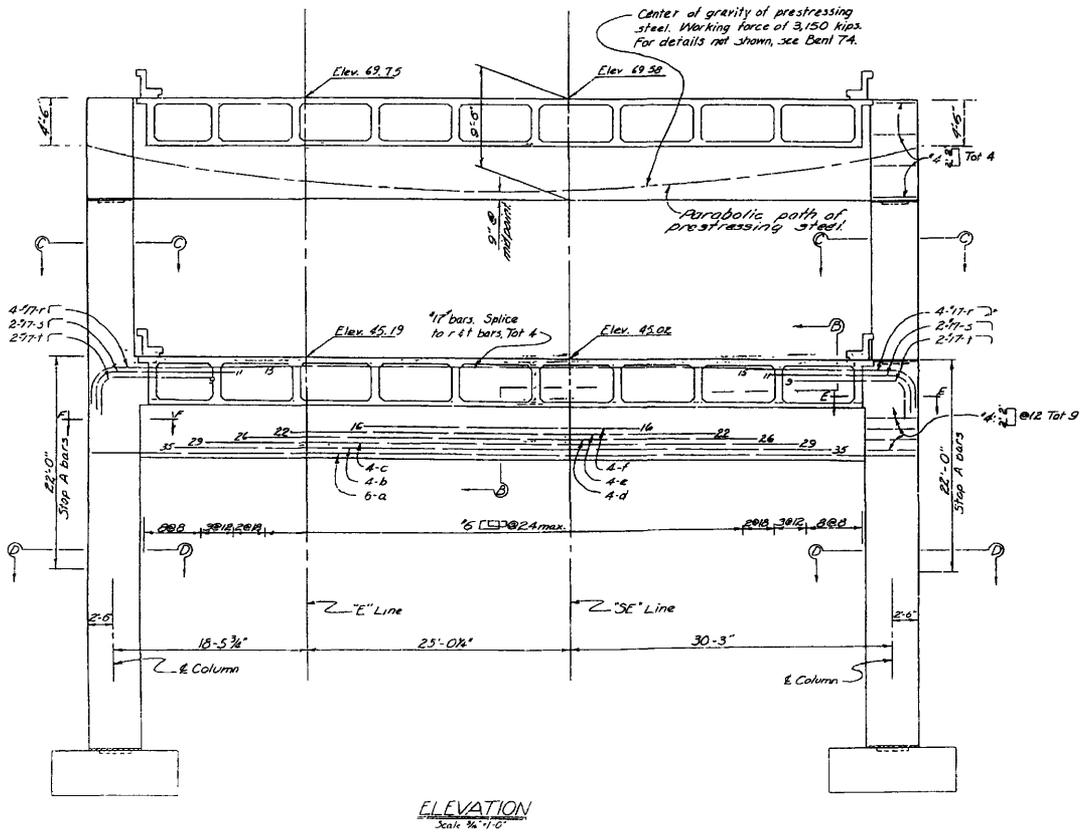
Elevation drawing of Bent 78 at Embarcadero Viaduct.
